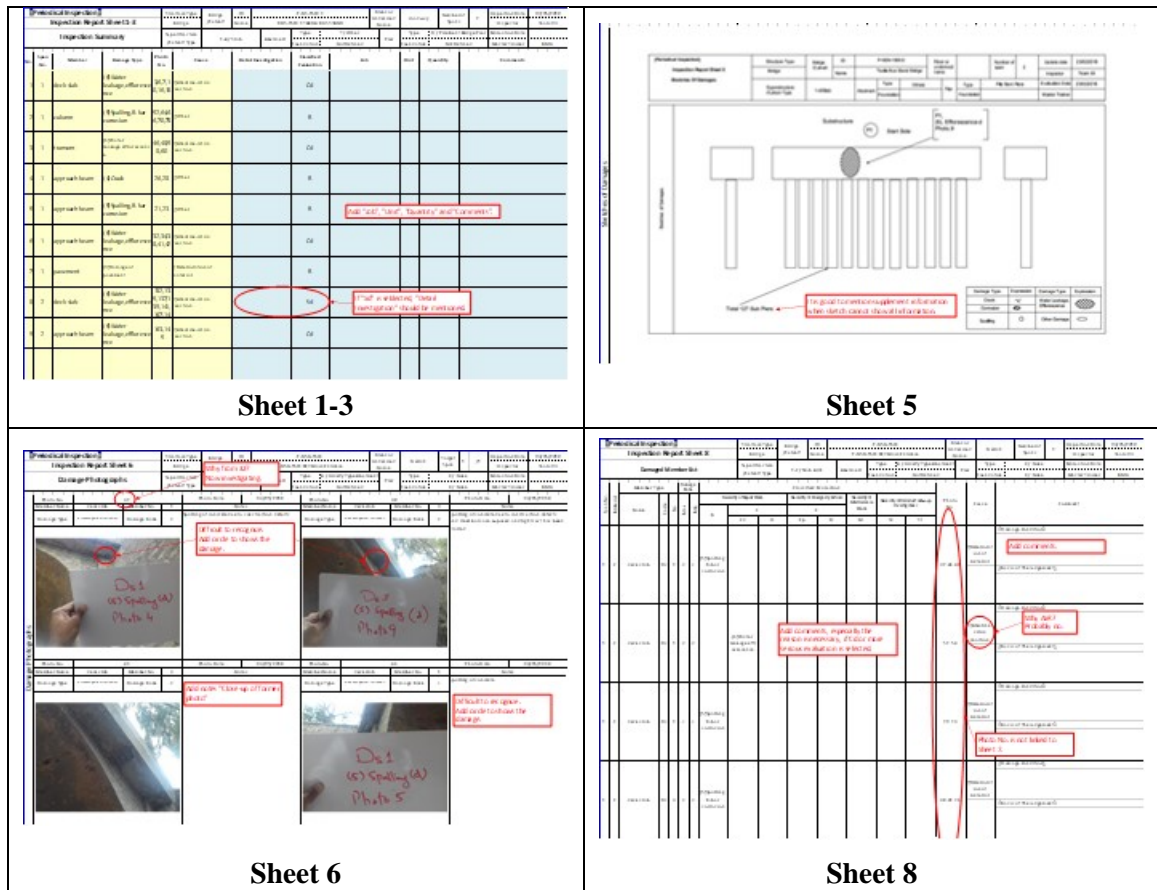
Corrections of Bridge Inspection Sheet
